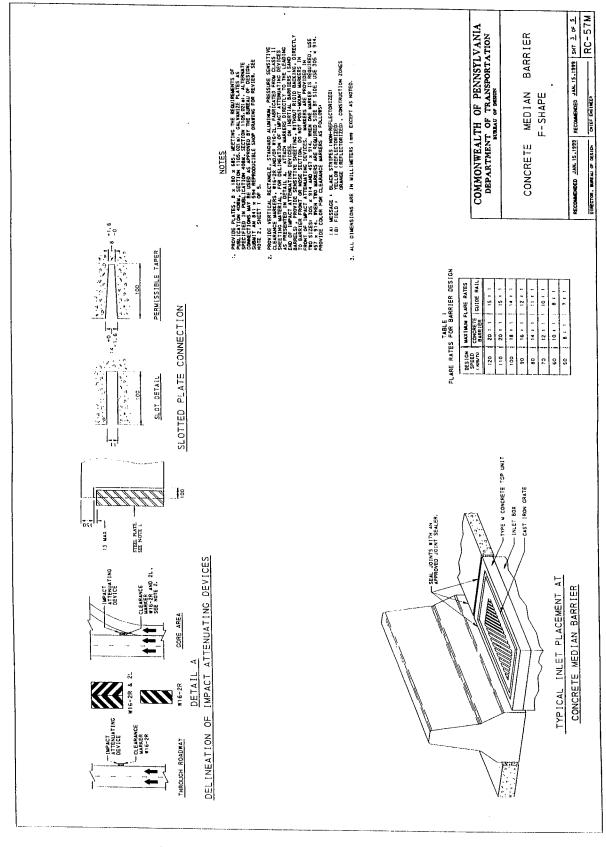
Detailed drawing of concrete median barrier F-shape (3 of 5).
